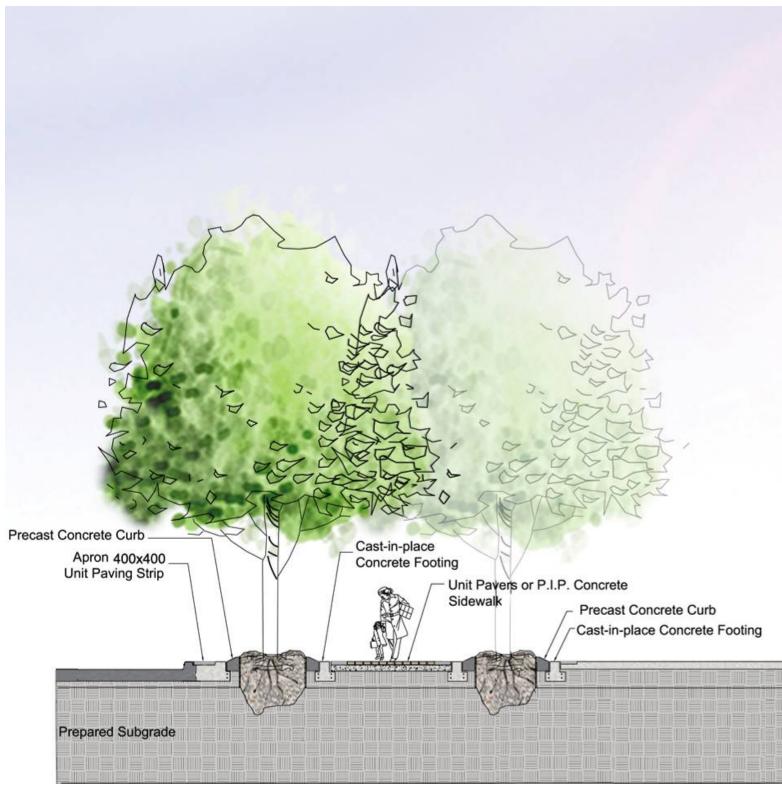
Typical Streetscape Detail - Primary Road, East & West Boundary, Marc Santi Blvd. * For specific planting details refer to Appendix 2.1 In-ground Planting
